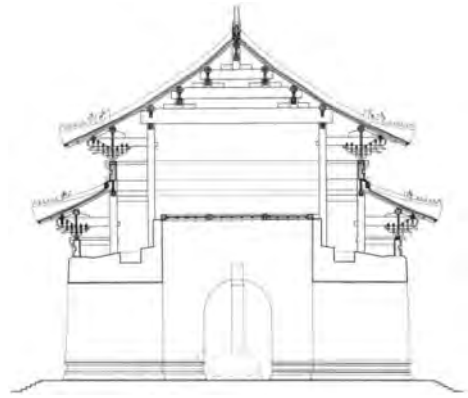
Construction principle of raising and depression of the “Chinese roof” of the Official Building in Northern China Source: drawing by the author.
